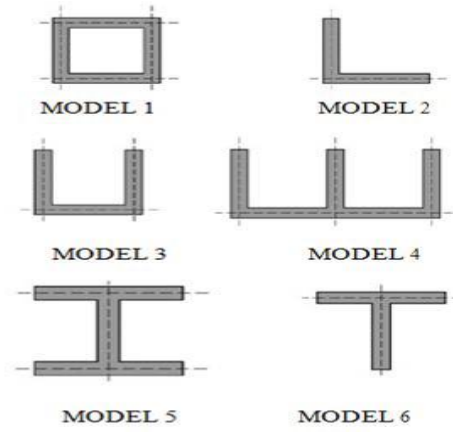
Types of shear wall (Romy. M et al (2011))
